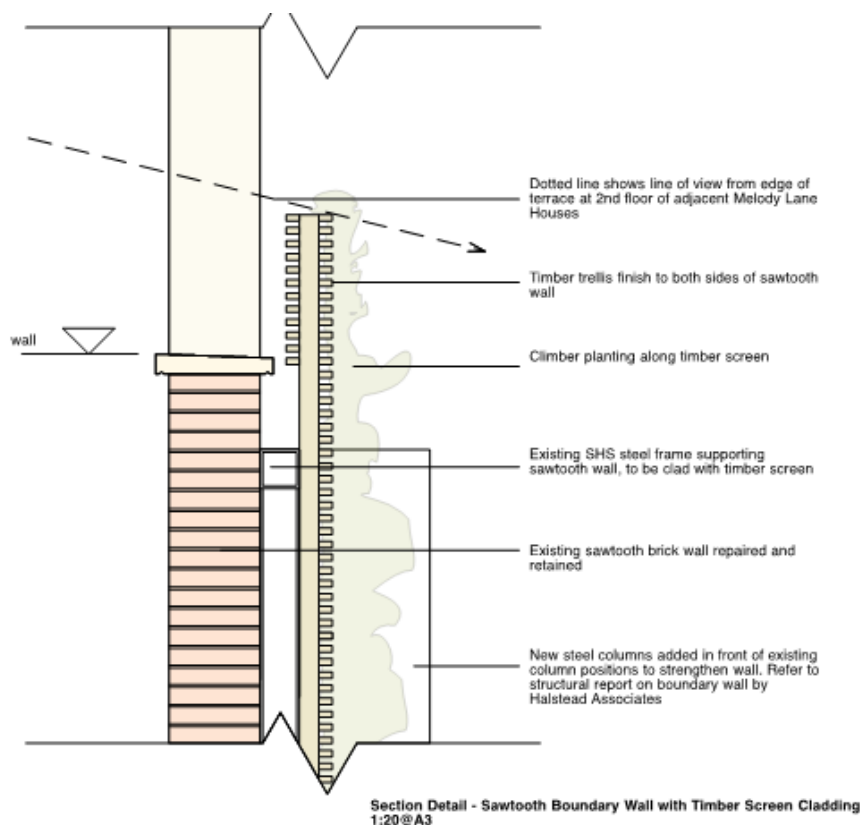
Section through the proposed sawtooth wall and timber screen.
